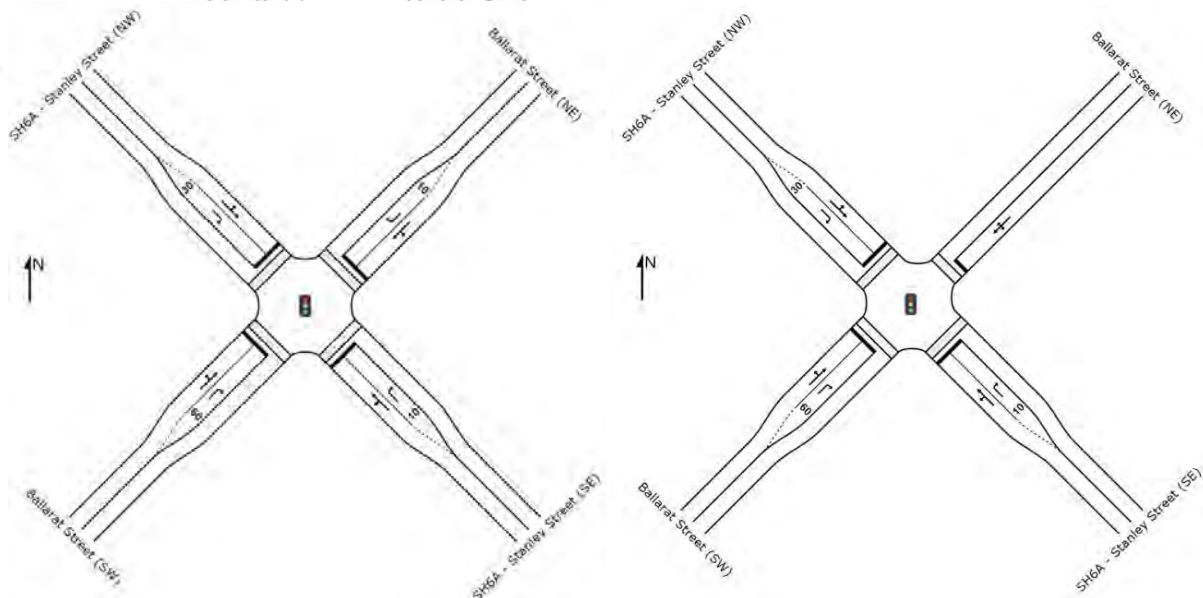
Stanley Street (SH6A)/ Ballarat Street updated signalised intersection, previously modelled (left) and proposed (right)
